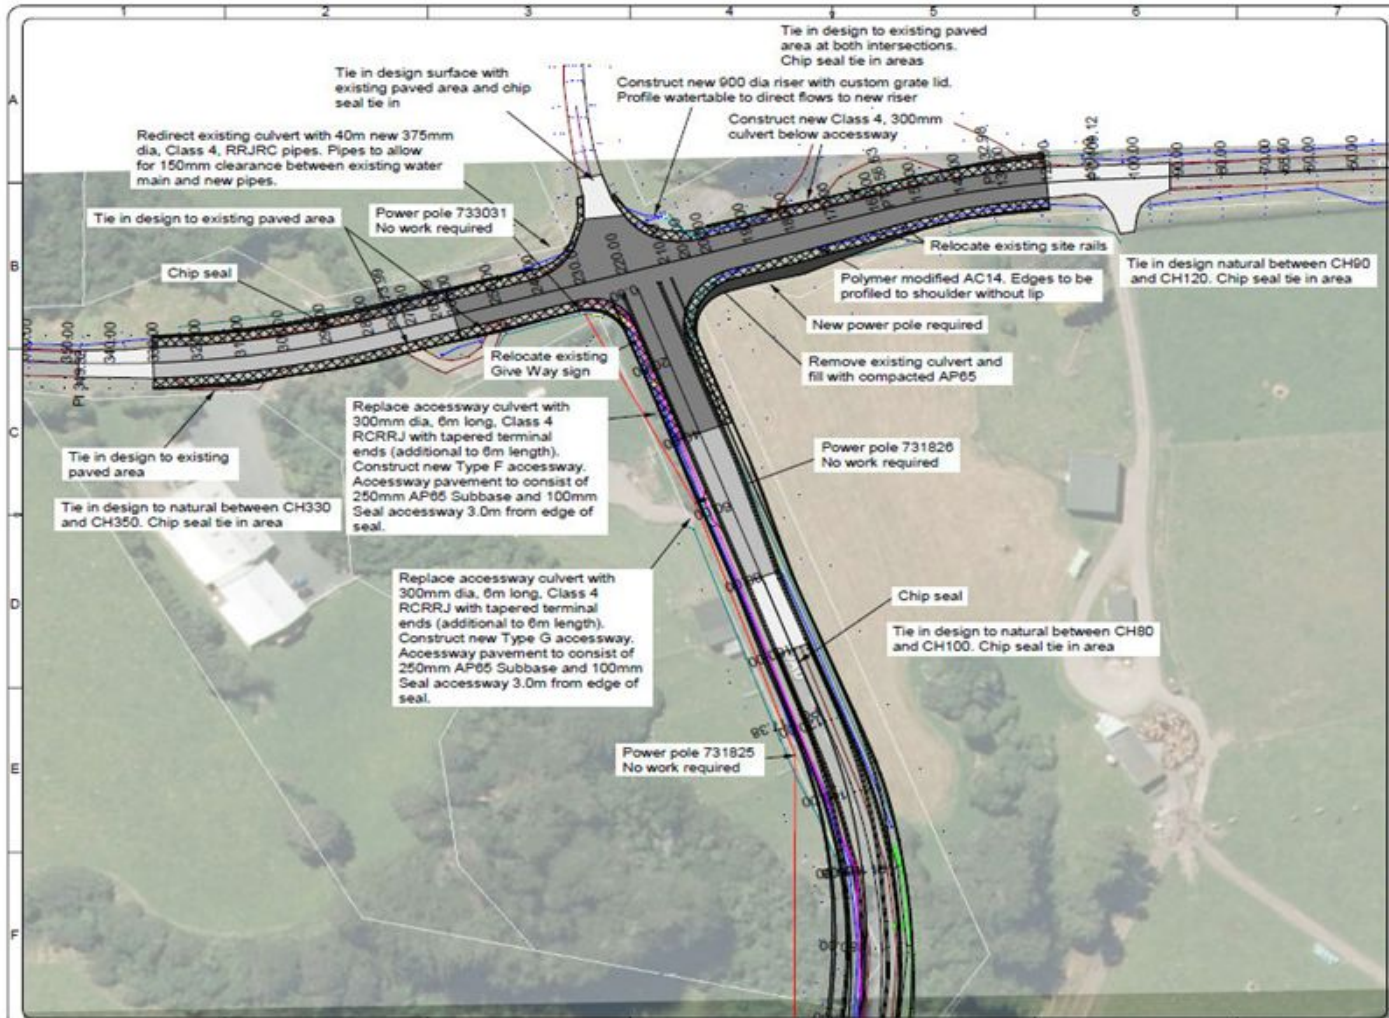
Scheme plan of the Opunake Road-Palmer Road Intersection Upgrade
